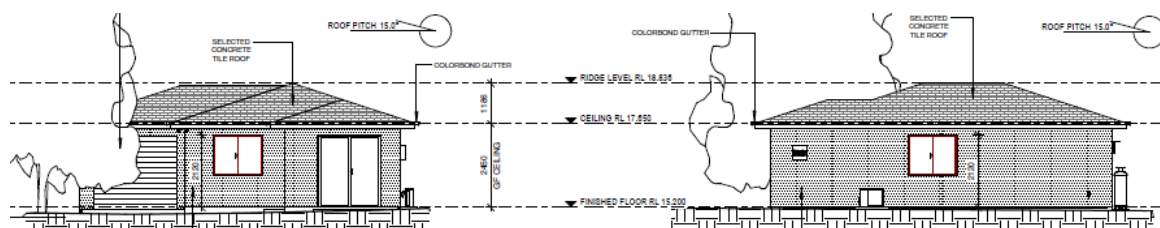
Eastern (front) and Northern (side) elevation (source - RESCON Builders)
